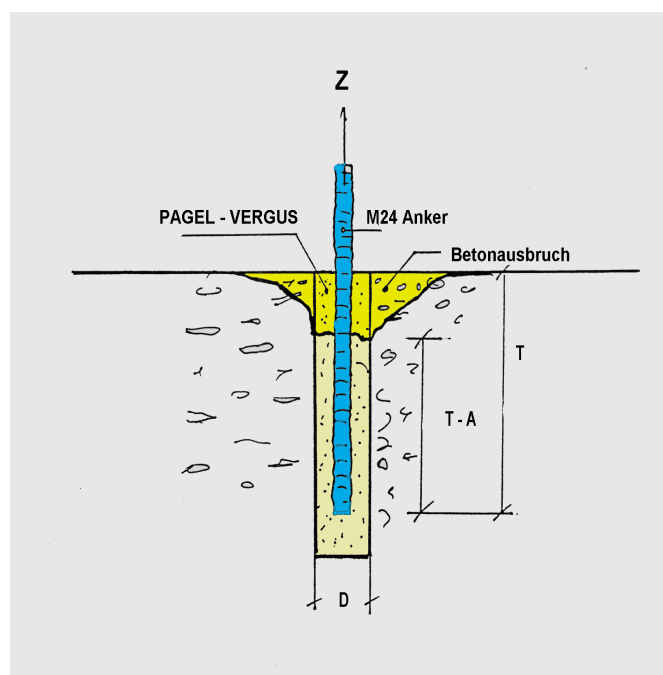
examples of sub-grouting showing basis plate and anchor bar
